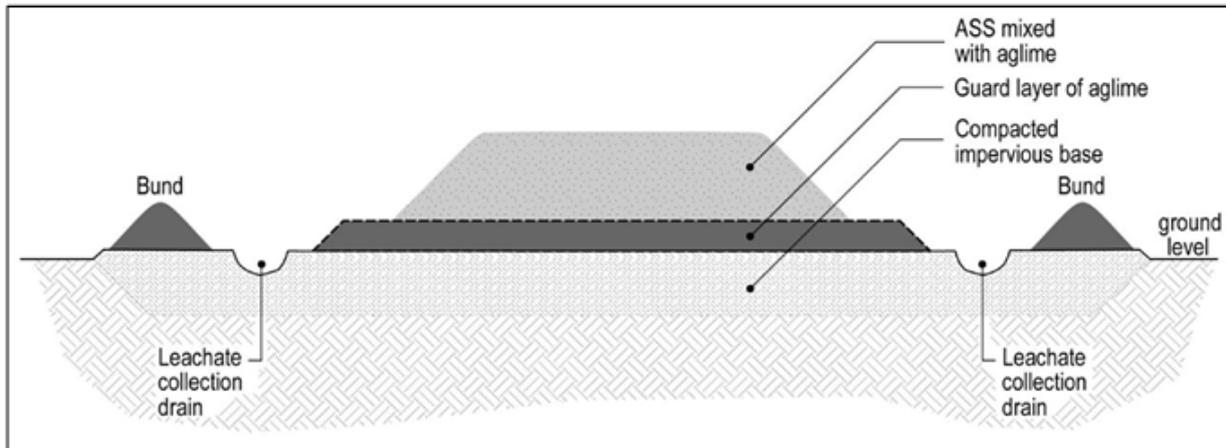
Schematic cross-section of a treatment pad (Queensland Government, 2024)
